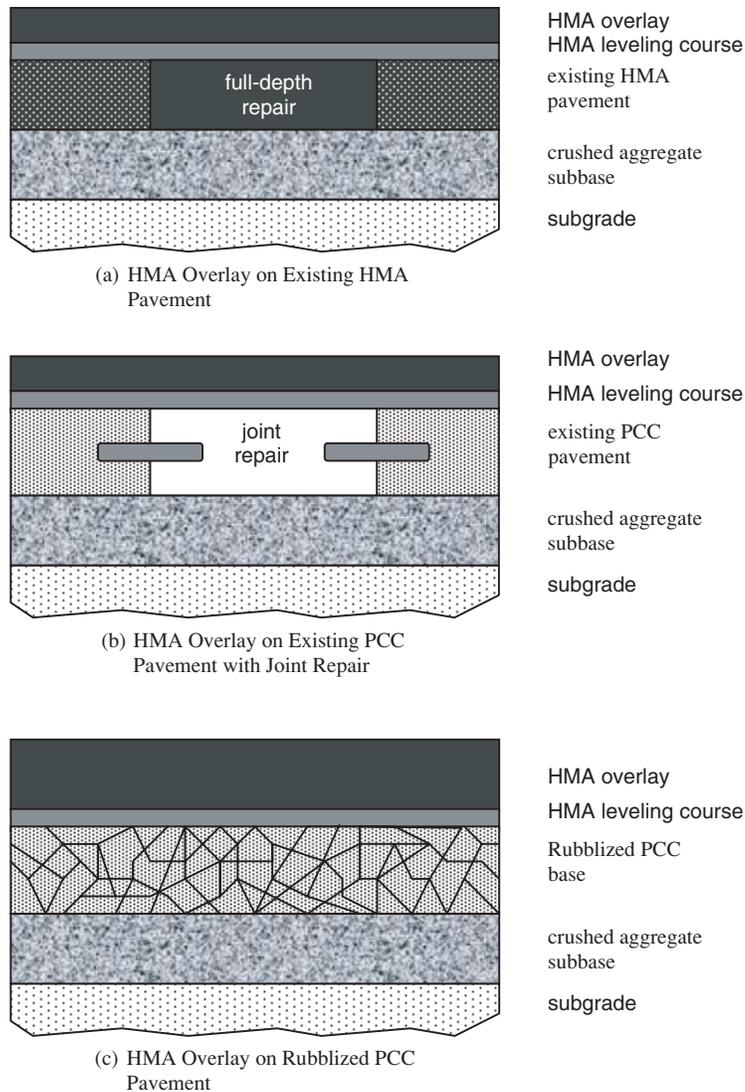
Cross-sections for typical asphalt pavements in rehabilitation.
